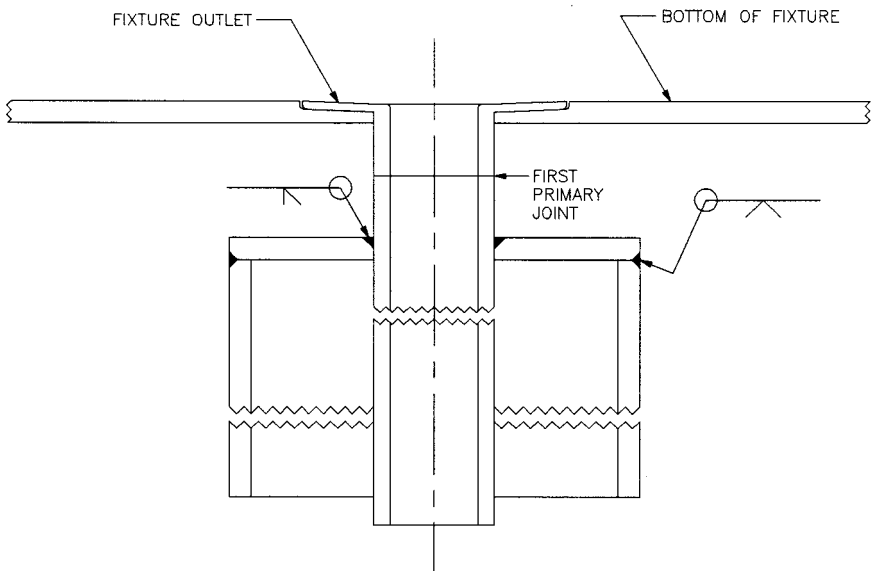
Configuration for fixture outlets where the first carrier joint is above the level of the secondary containment jacketing. In this type of arrangement, a leak at this joint could escape around the secondary containment pipe.
